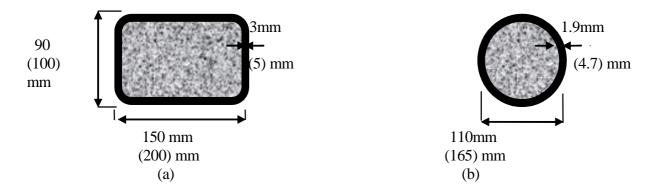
Cross-Sectional Dimensions for Test Specimens: (a) Concrete-Filled RHS; (b) Concrete-Filled CHS
